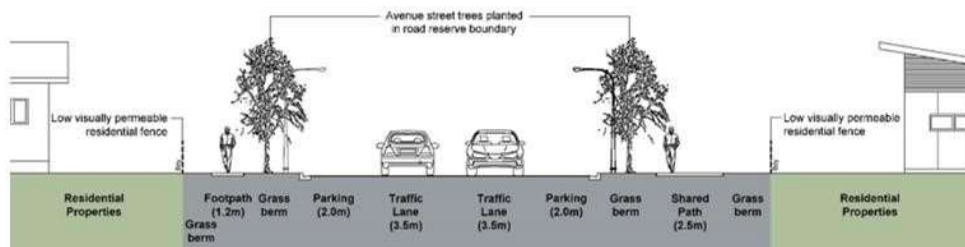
F: Cross section of Collector and Secondary Collector Roads in the General Residential Zone
